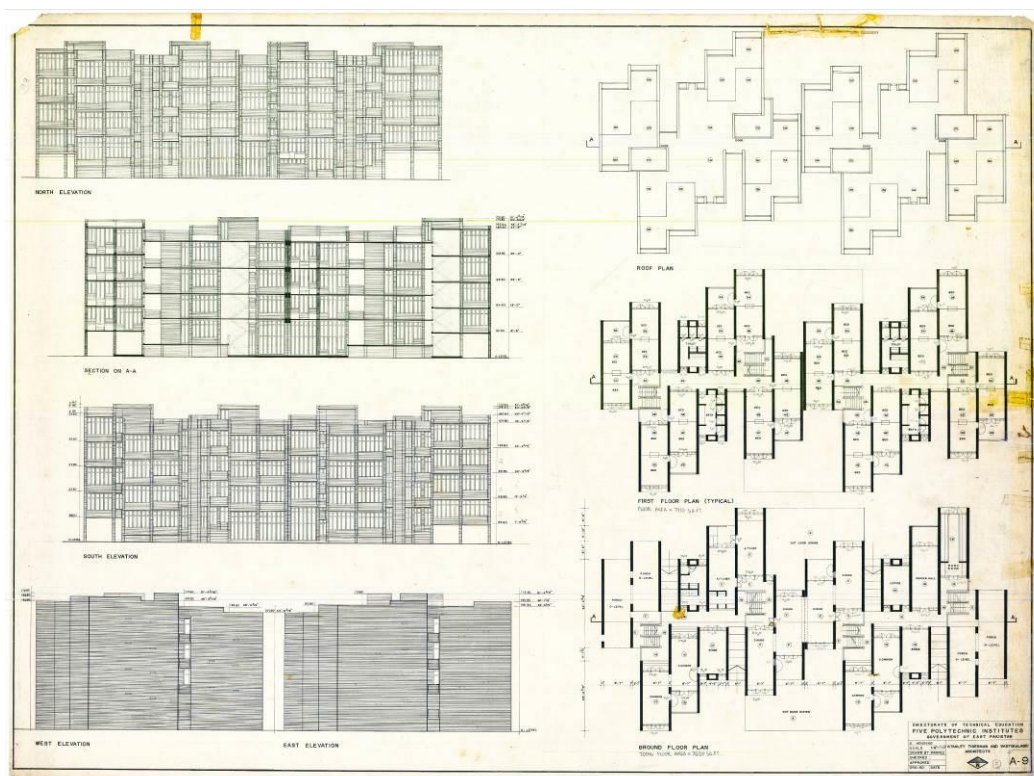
Floor Plans, Elevations and Sections. Housing, Polytechnic Institute, 1966.
